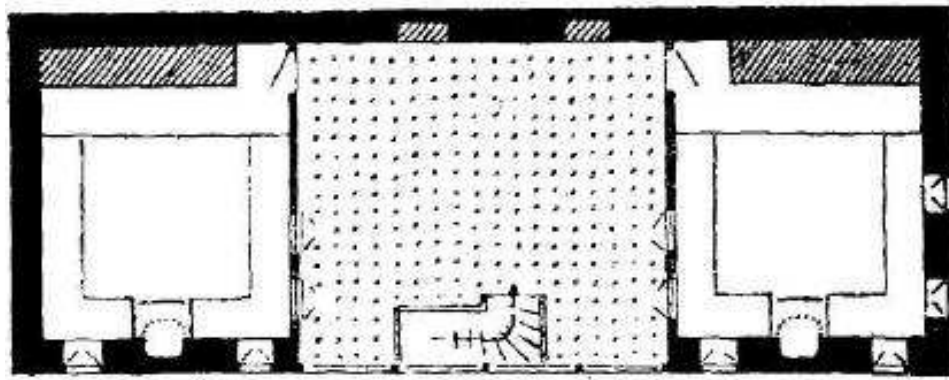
The plan's drawing of the example of a Bergama houses with an inside Sofa in the book "The plans of the Turkish houses" by Eldem. (Prof. Dr. Neslihan Sonmez. Bergama Belleten n.8. Bergama. İzmir Printing House, September 1998)
